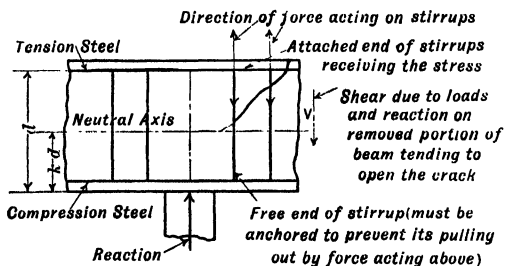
Action of Stirrups in Continuous Beams. (See p. 522.)
